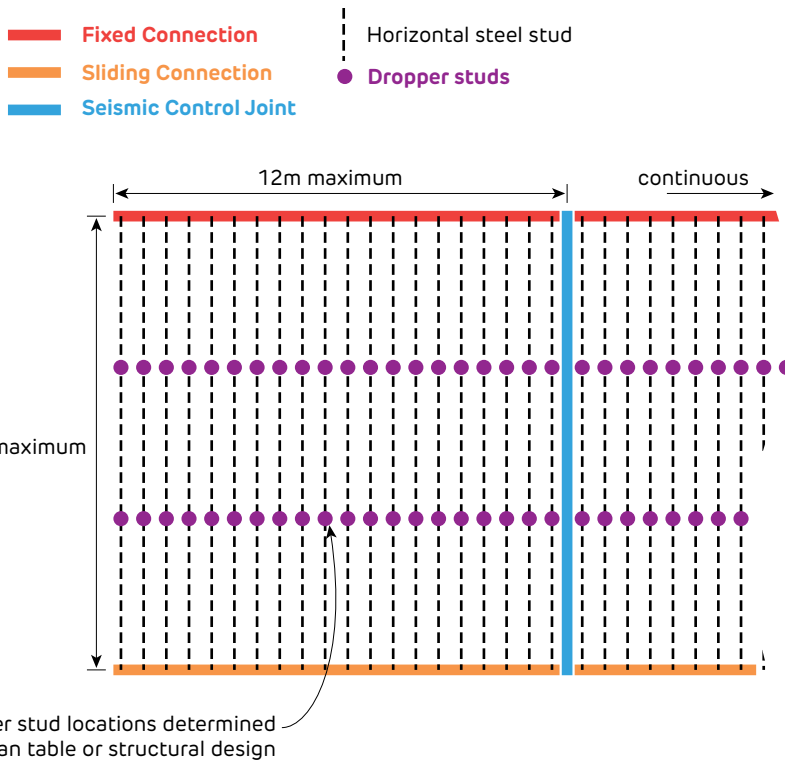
Stud Ceiling Type A2 - Fixed / Sliding
